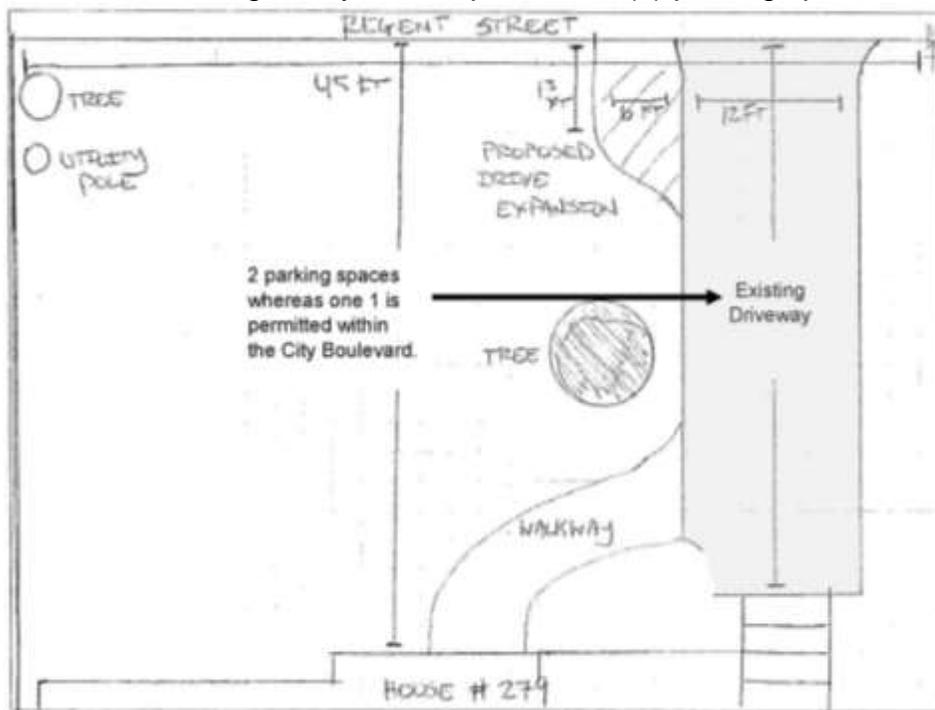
Conceptual Site Plan indicating the location of the driveway.
